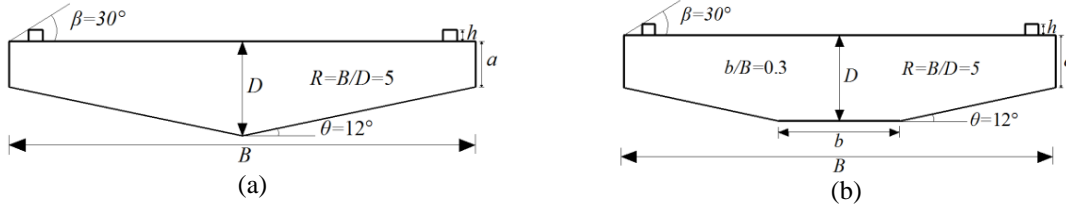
Geometric configuration of the considered bridge decks: a) Pentagonal shaped bridge deck and b) Hexagonal shaped bridge deck
